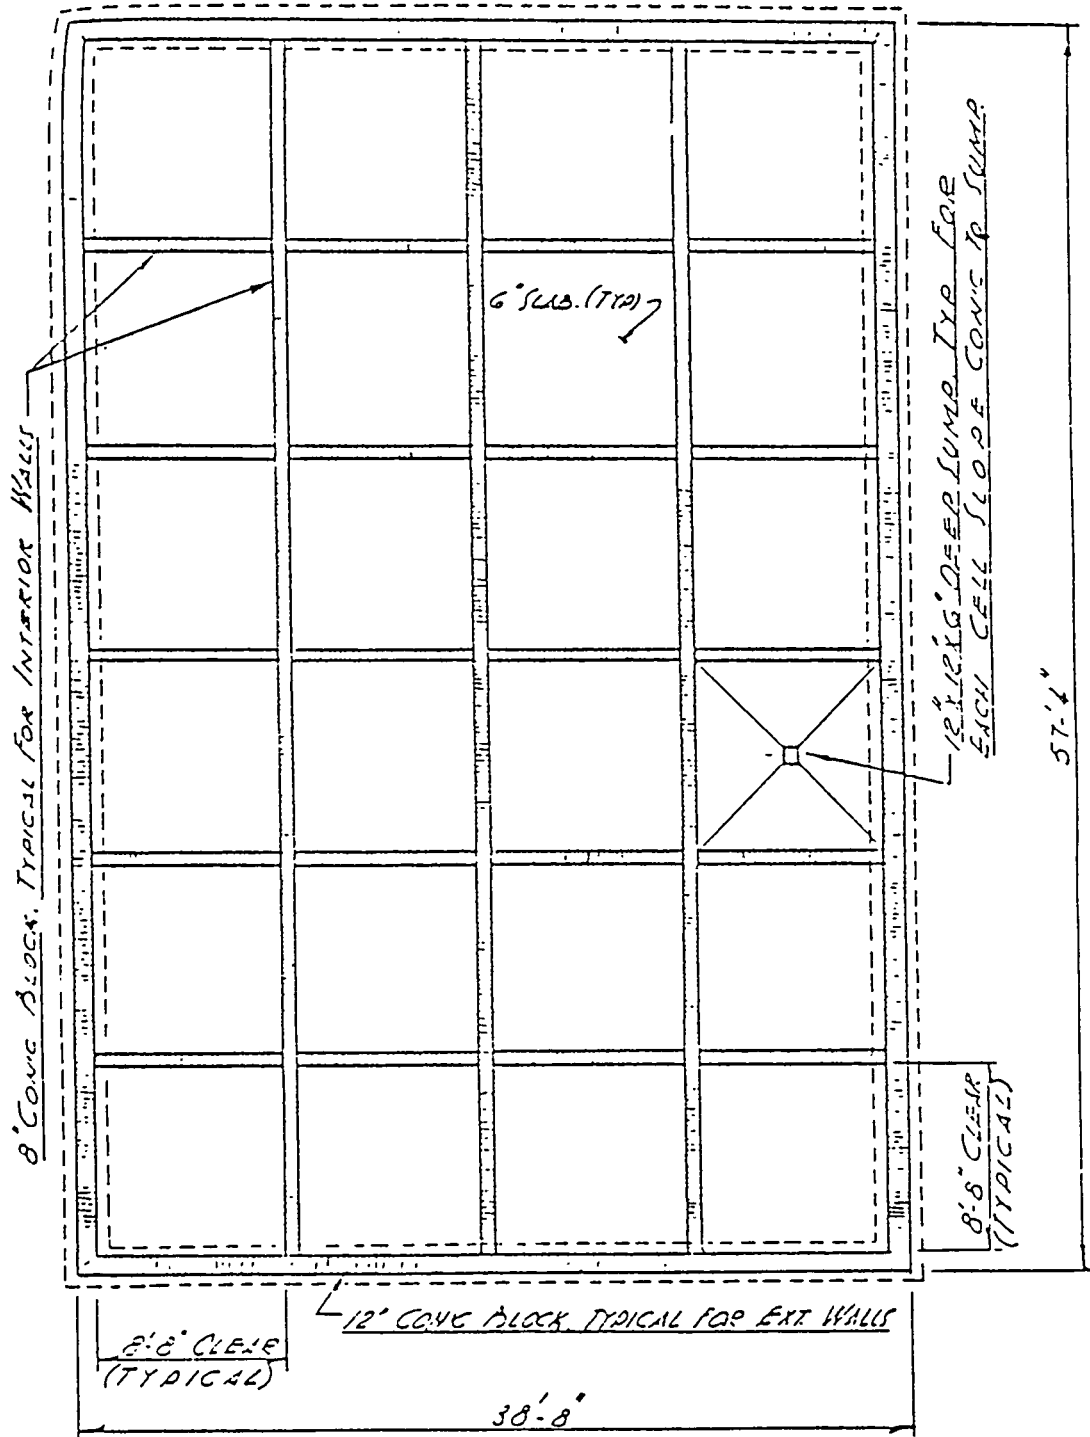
STORAGE FACILITY FLOOR PLAN FOR RETRIEVABLE WASTE PACKAGED IN DRUMS
